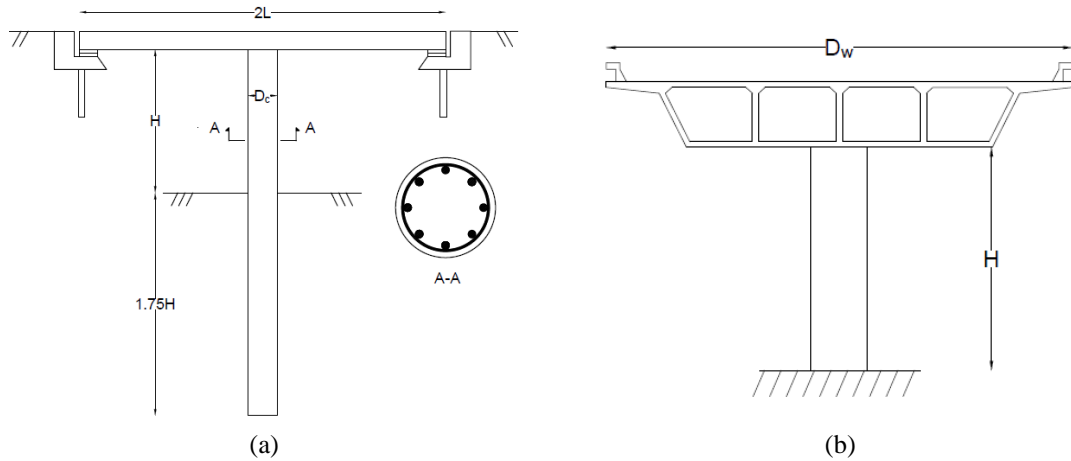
(a) Longitudinal view of the single-frame box-girder concrete bridge and (b) transverse view
